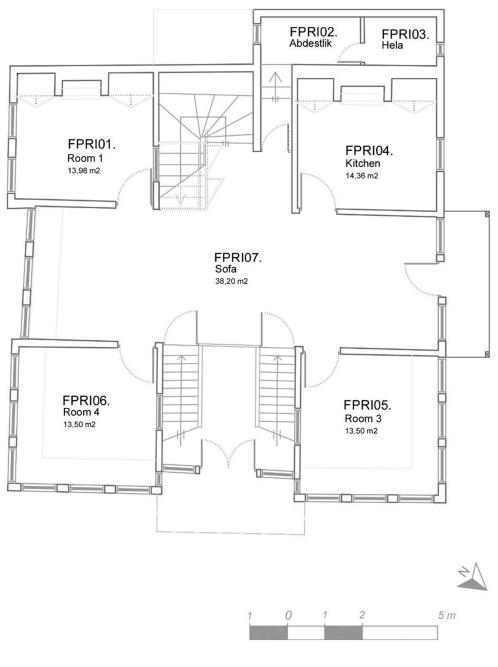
Pre-intervention ground floor plan of Kadirler house (Prepared by Selim, 2005 and redrawn by the Author, 2023)
